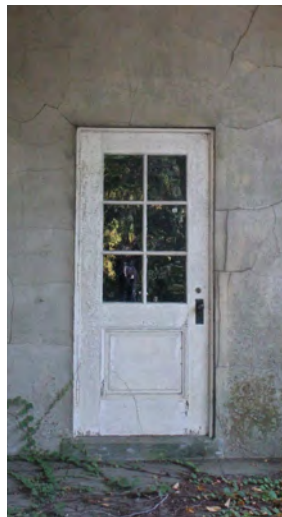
Six lite, single paneled door to porch. (HA, 2015)
